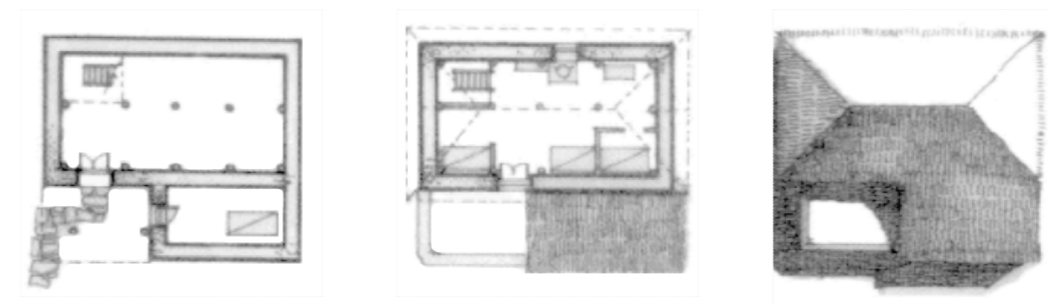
Plans of mushroom house. (Yang & Zhu, 2009, p.103)
